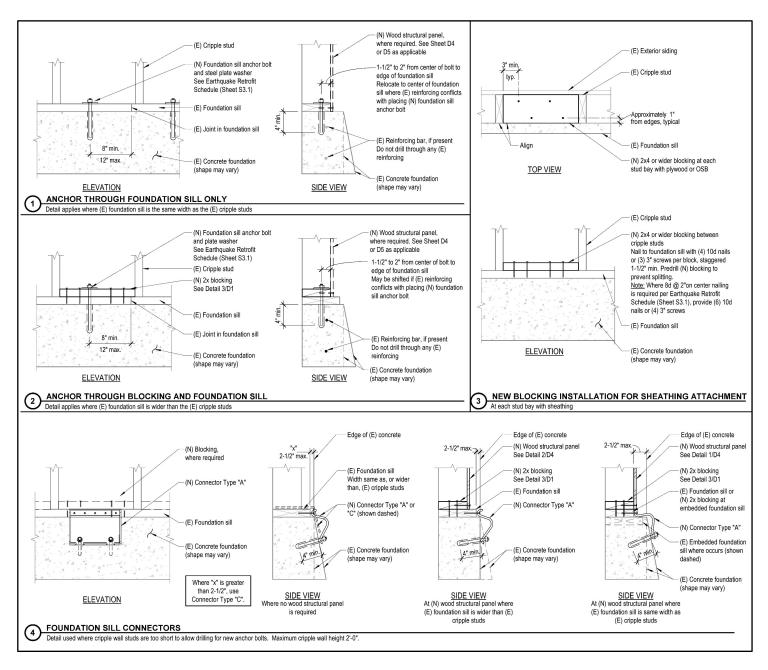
Foundation sill to concrete foundation connection details. Sheet D1.
